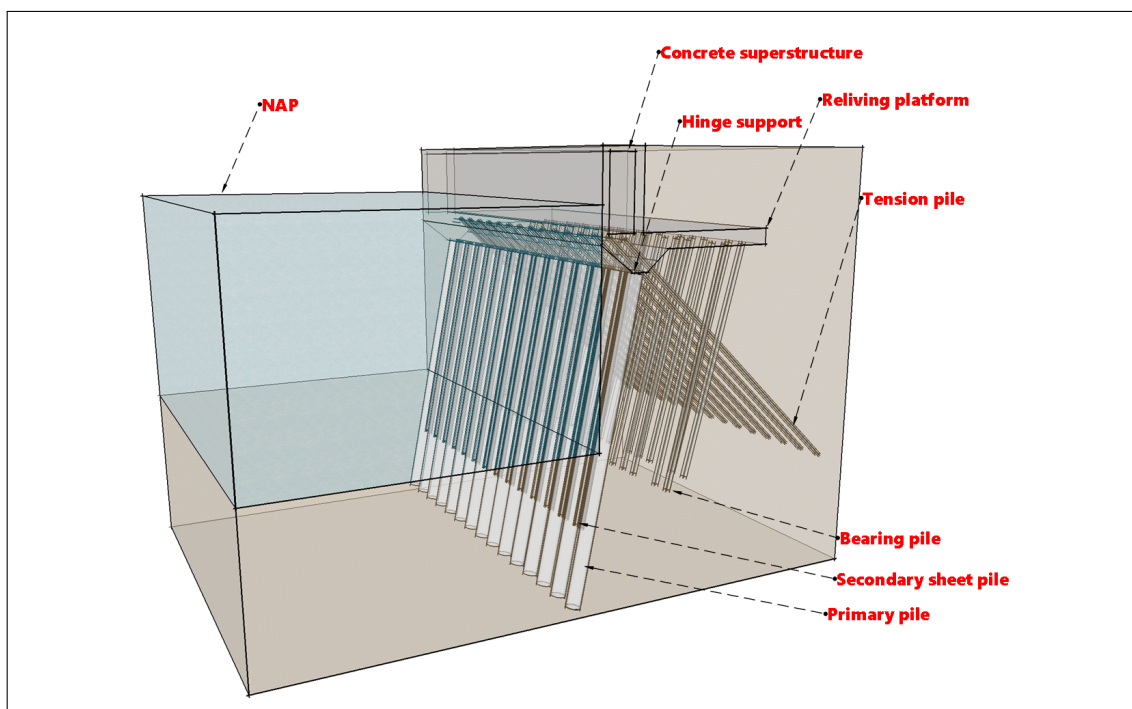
Cross-section of low relieving platform quay wall structure, used SketchUp
